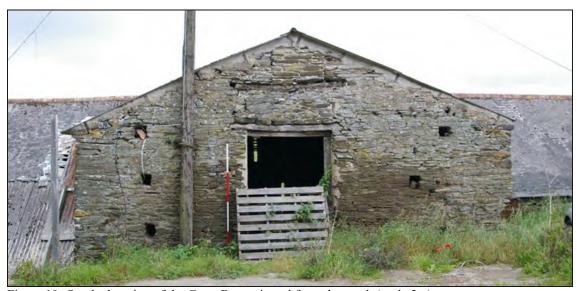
South elevation of the Great Barn, viewed from the south (scale 2m).
